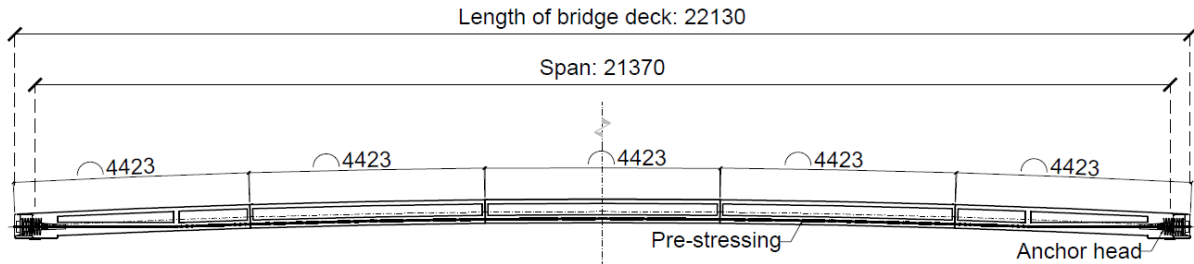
Layout of pre-stressing ducts in the bridge deck
